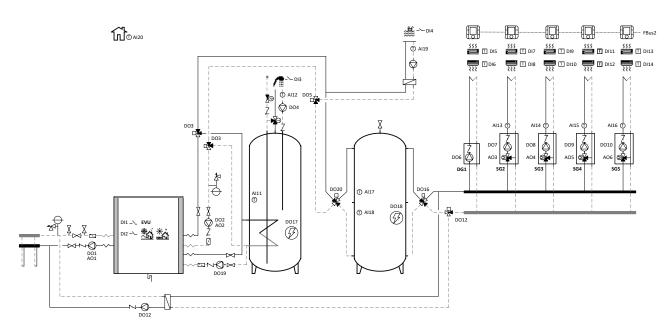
Wiring scheme using one buffer storage tanks (ecoGEO+ HP3 models).
